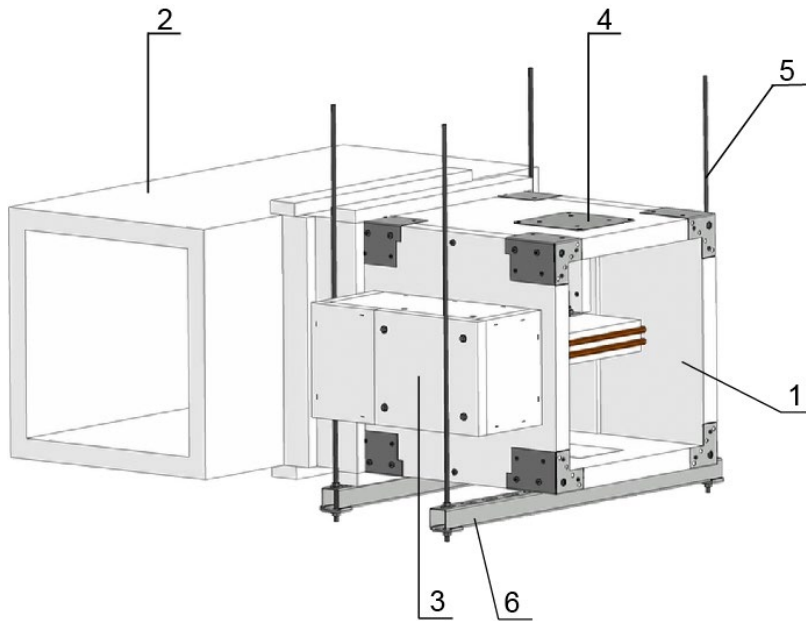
Installation to the side of horizontal duct with blade and spindle in horizontal position.
